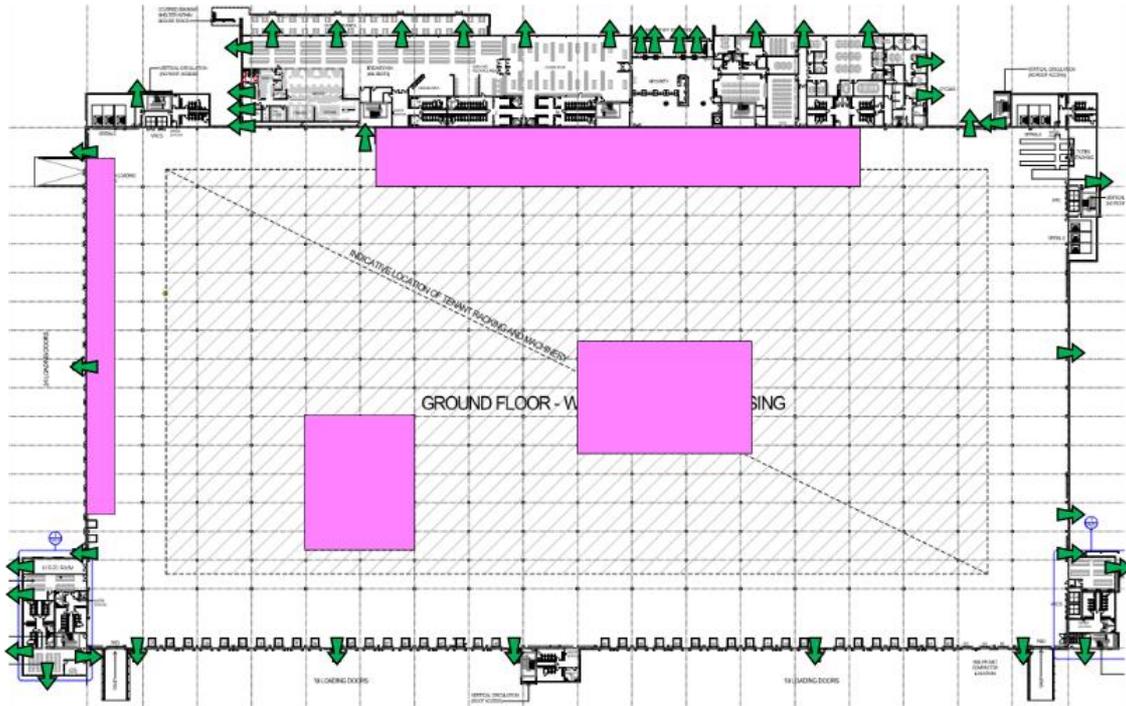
Ground Floor egress points and mezzanine (highlighted pink)
